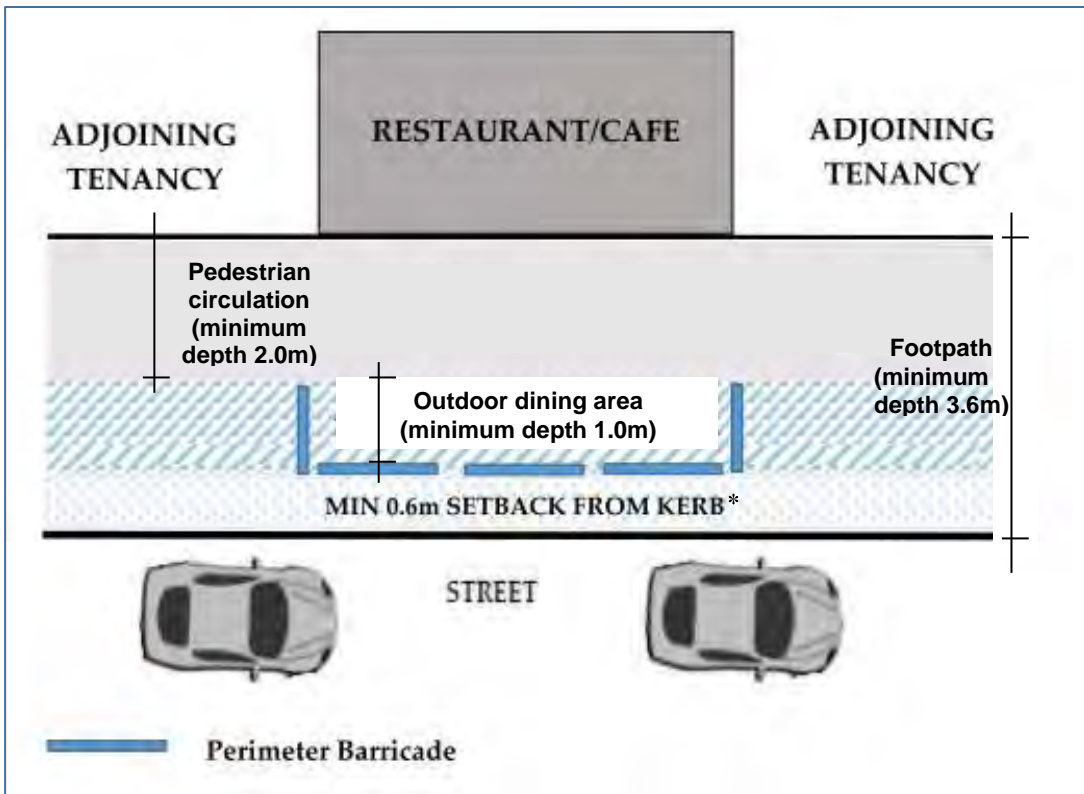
Minimum dimensions for outdoor dining on primary retail streets adjoining car parking
